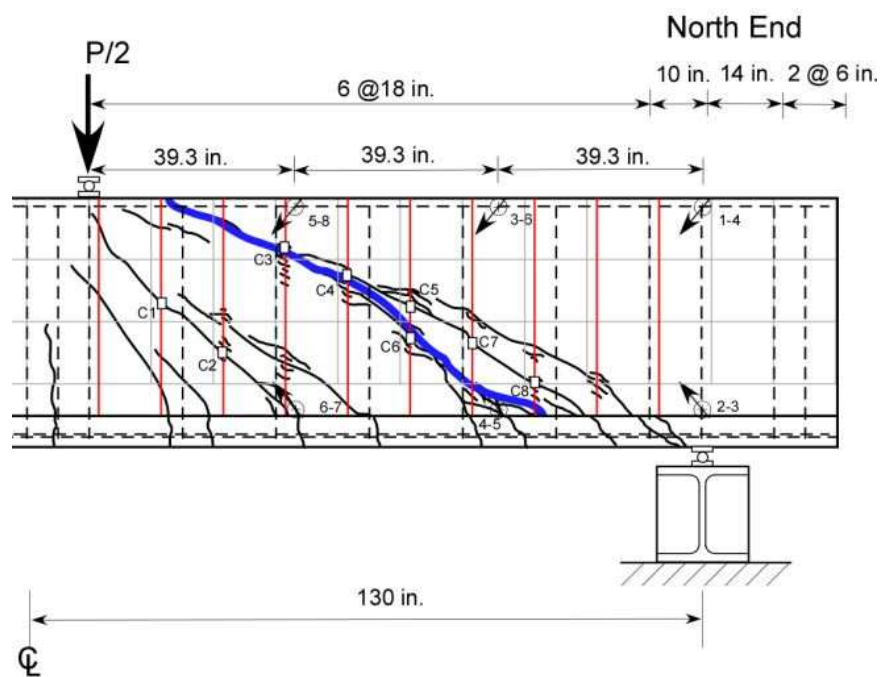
Specimen IT.7.18.12.S crack map (failure test)
